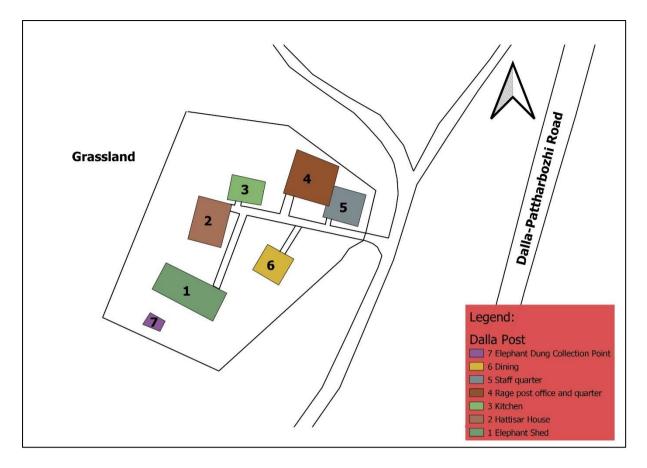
Proposed plan for Hattisar infrastructures at Dalla Hattisar
